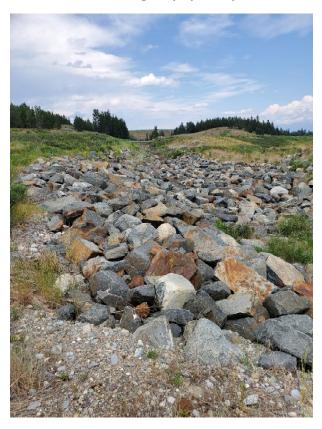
Emergency Spillway Channel outlet to Cow Creek
